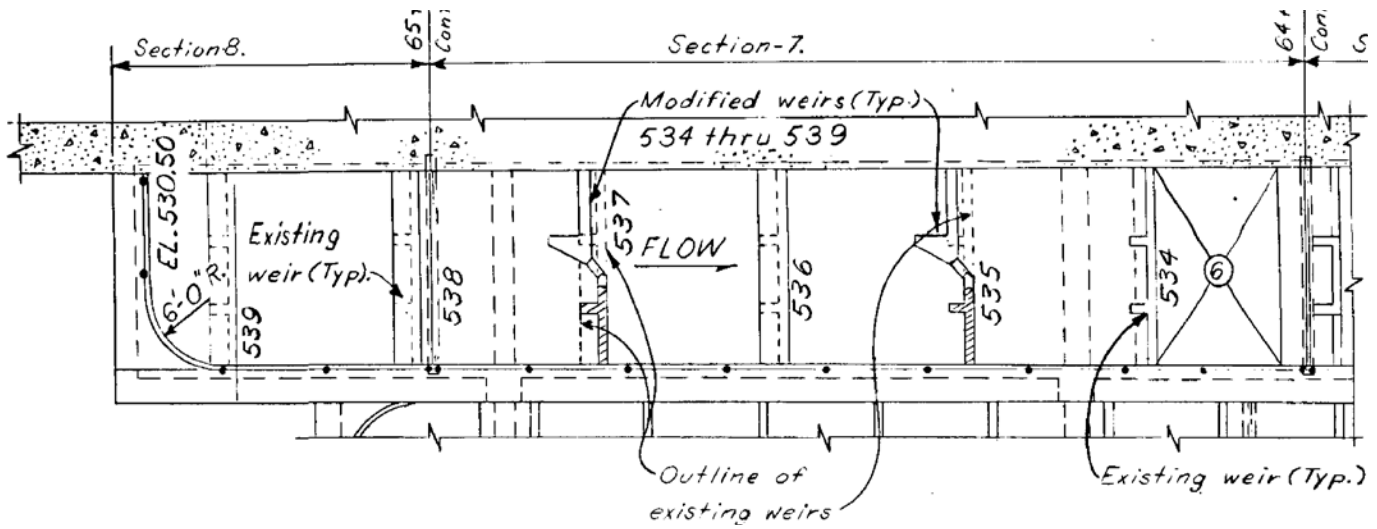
North Shore Fish Ladder Control Section Plan. Weirs 534 to 539 are to receive lamprey orifices.
